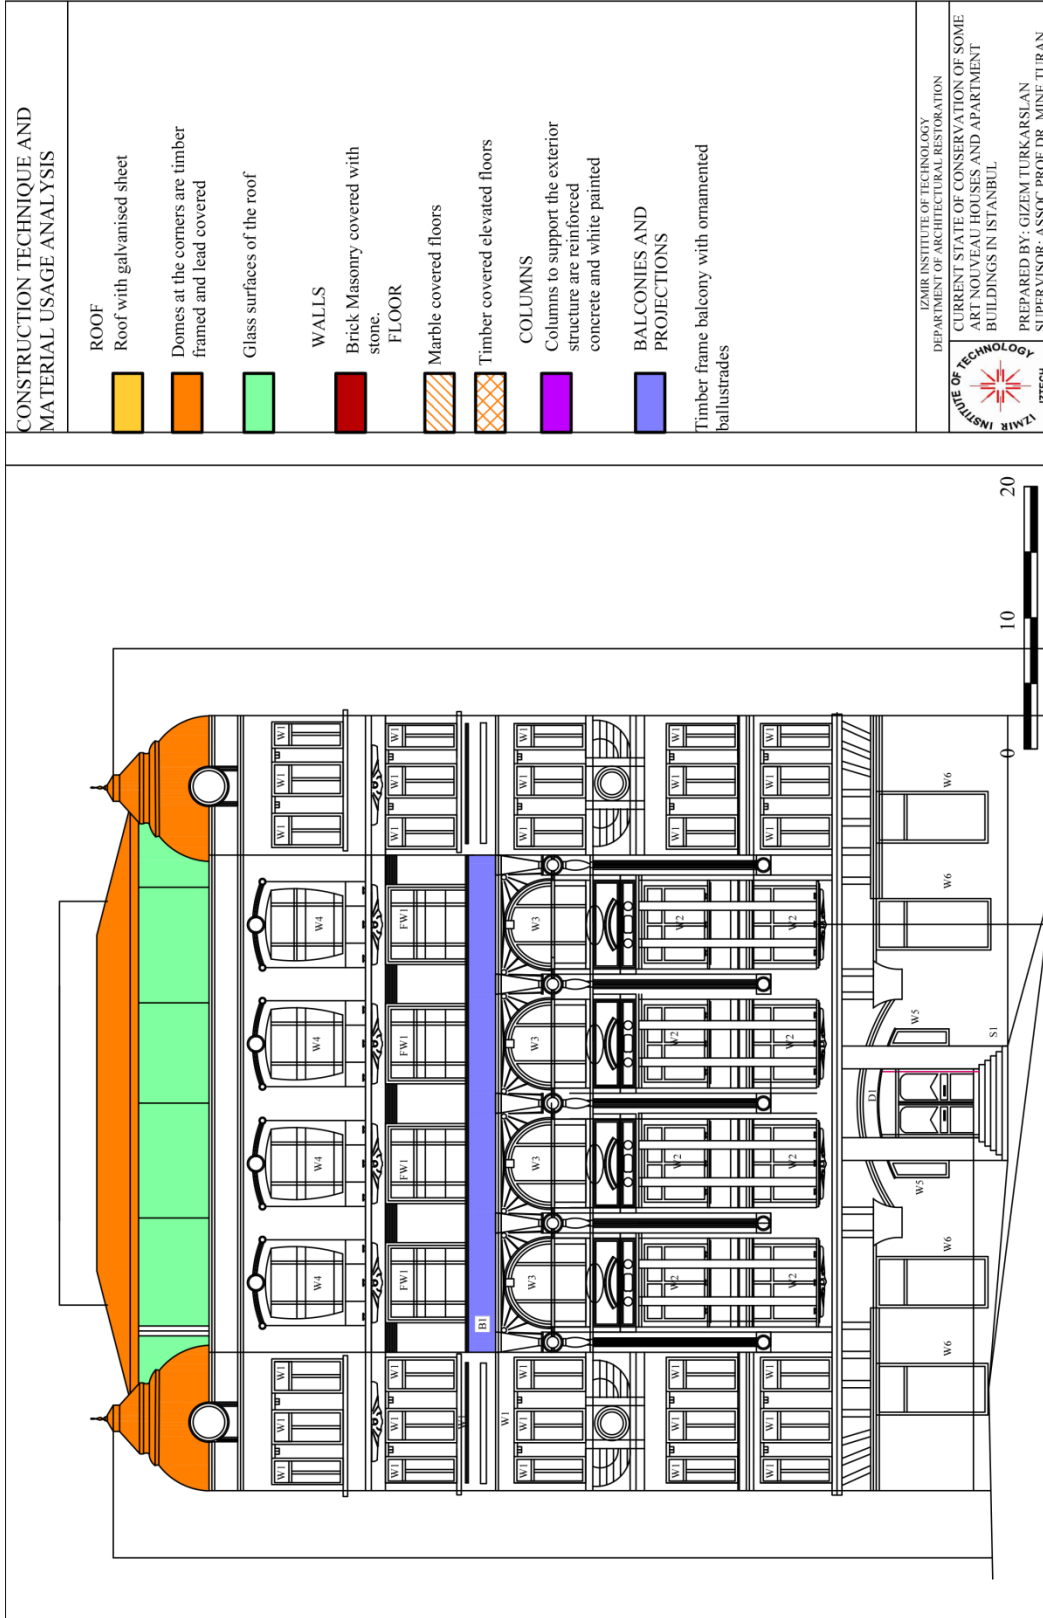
Entrance Façade, Construction Technique and Material Usage Analysis of Frej Apartment Building
